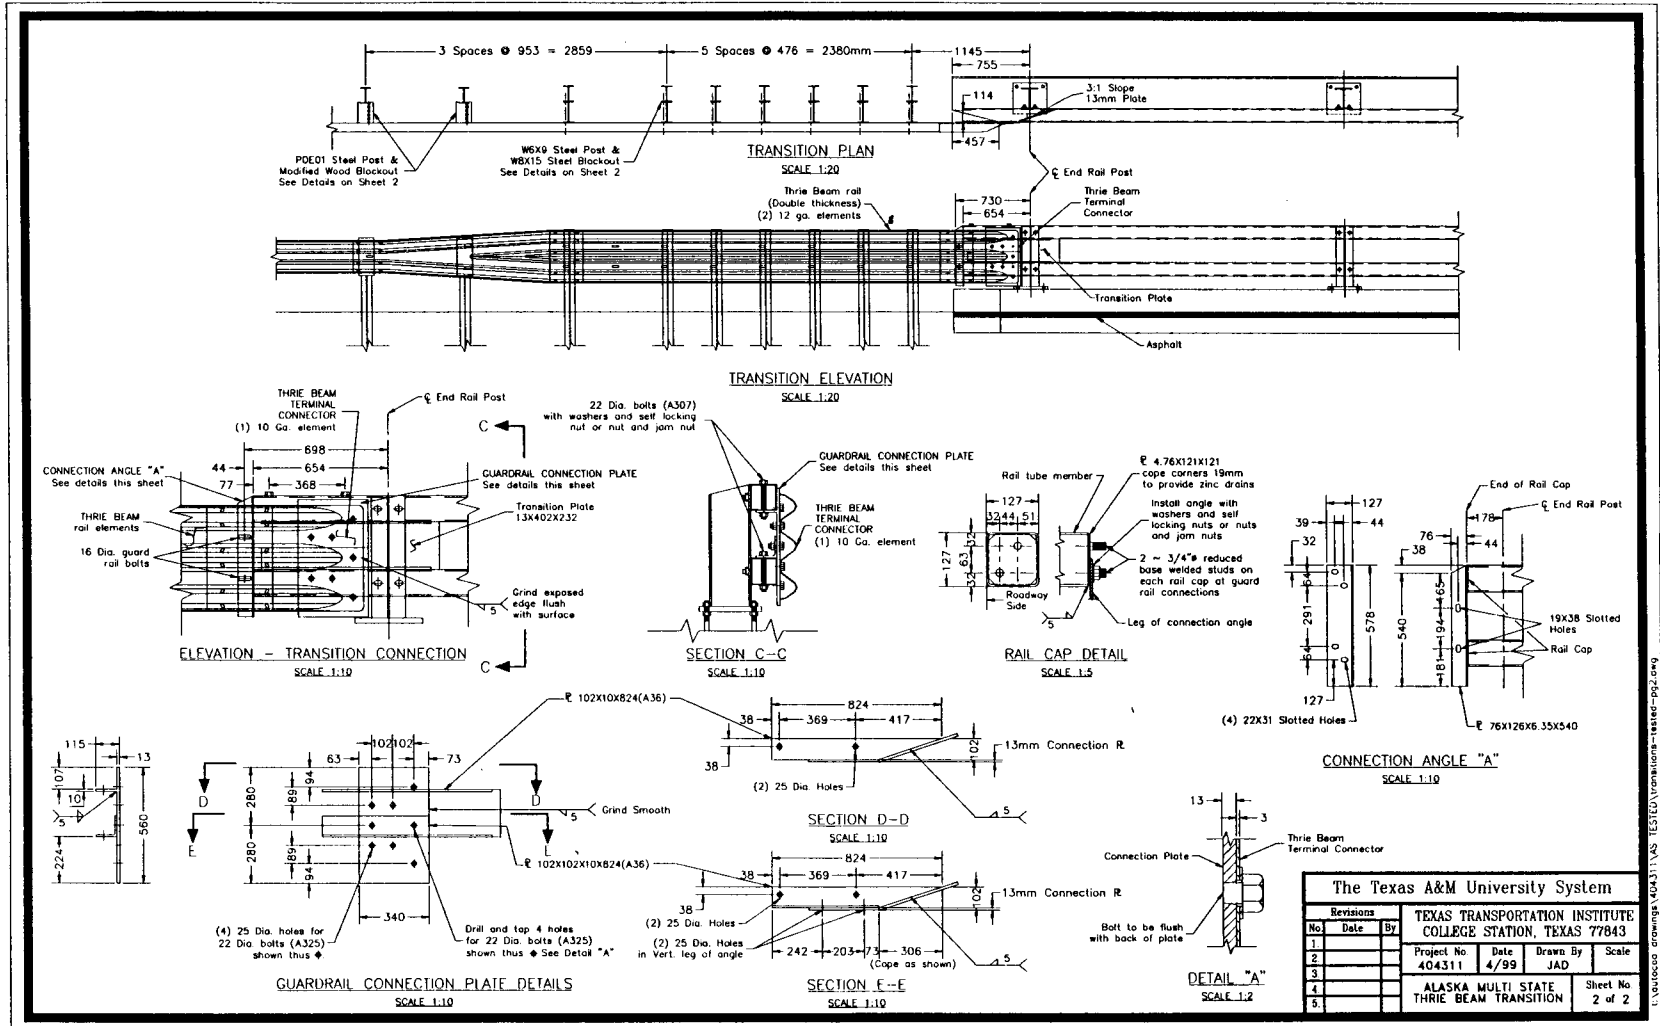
Details of the bridge rail connection of Alaska Multi-State Bridge Rail Thrie-Beam Transition.
